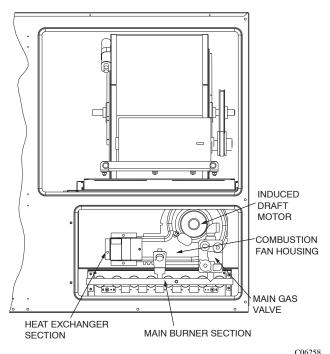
Typical Gas Heating Section (Sizes 08-14 Shown)
